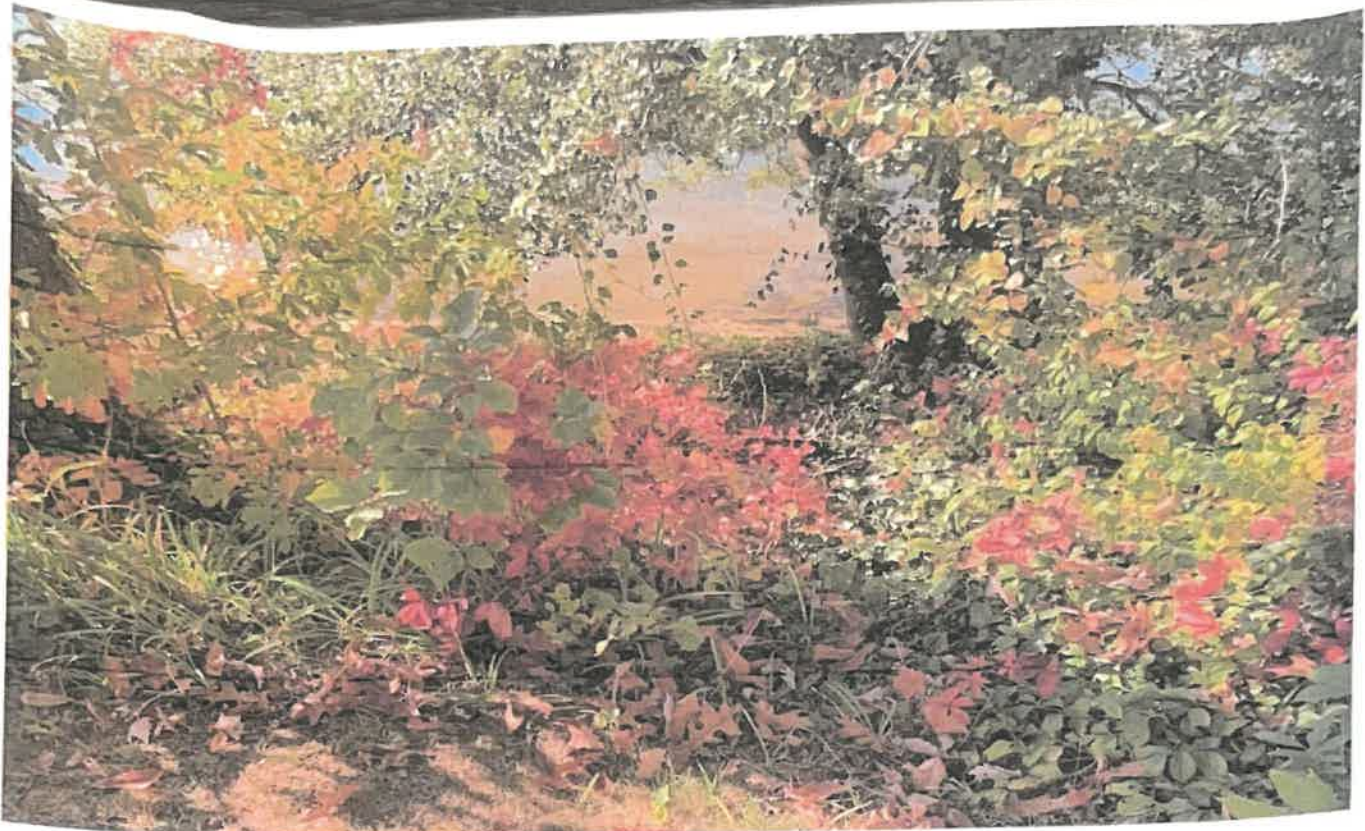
Looking West Towards Existing Bulkhead & Toe Of Slope, No Erosion Present
